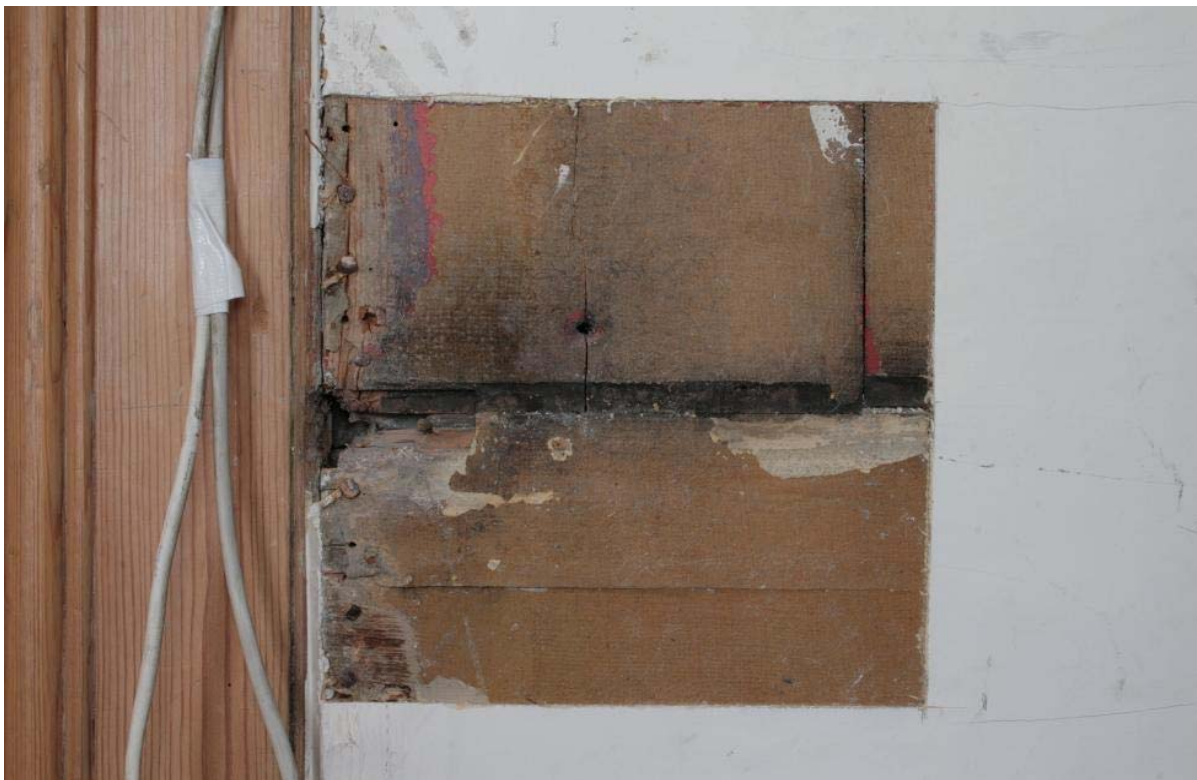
First Floor Temporary Gallery North Wall Opening Up Area 12 RmF/1-OU5 (PCA)
